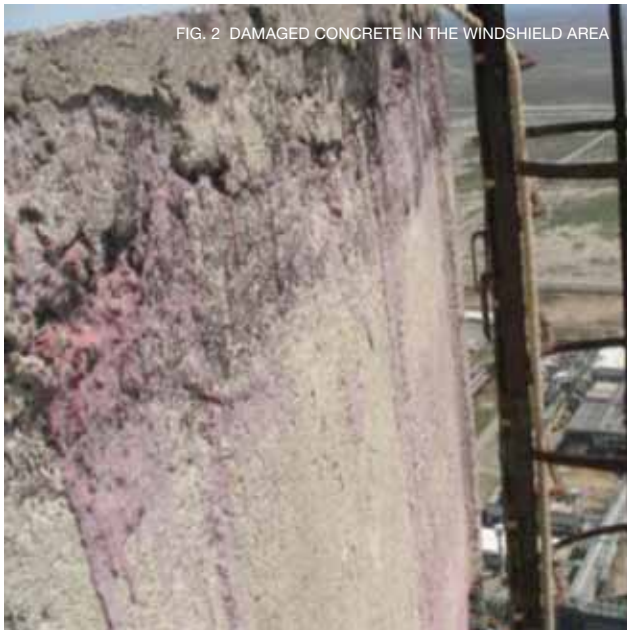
DAMAGED CONCRETE IN THE WINDSHIELD AREA
